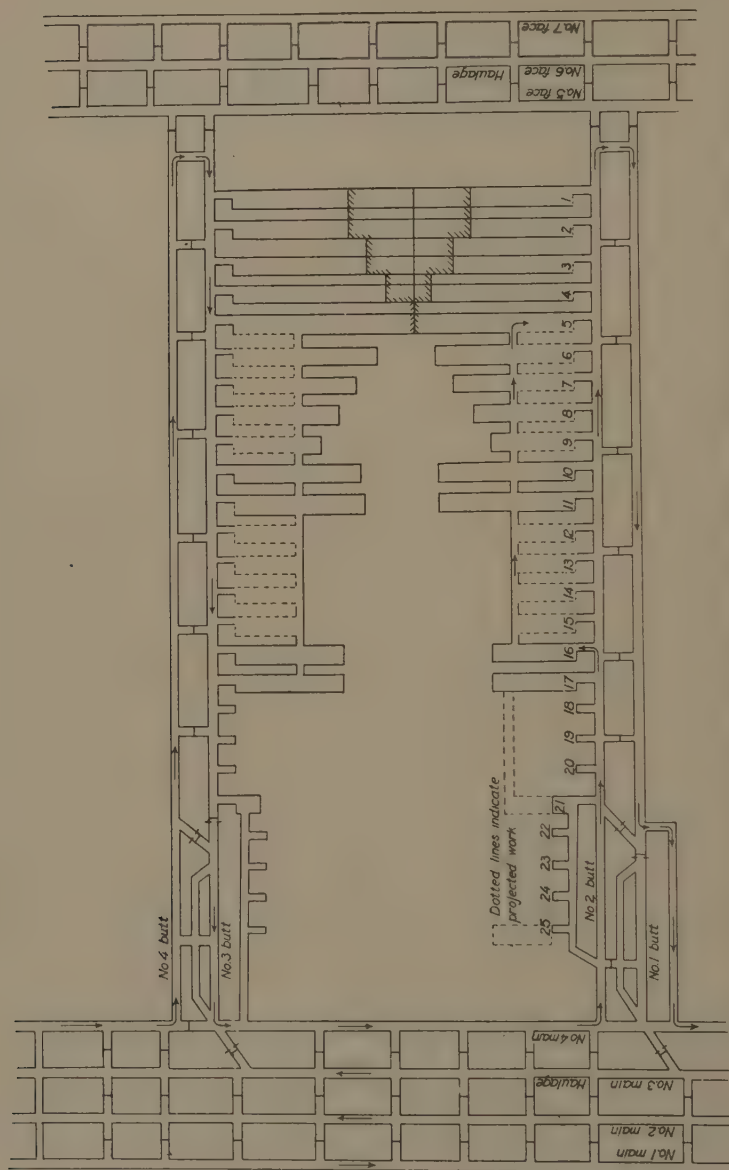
Sketch showing second step in method of drawing pillars, Pittsburgh Coal Bed, Western Pennsylvania.
